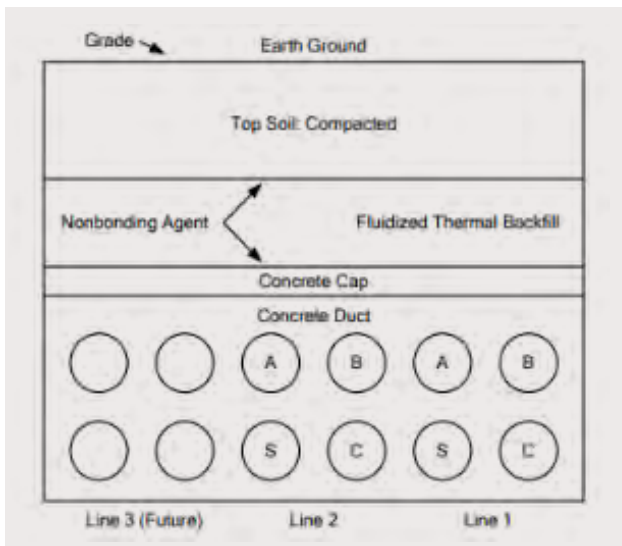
Underground Cable Trench Configuration (D. Bucco et al. [6])
